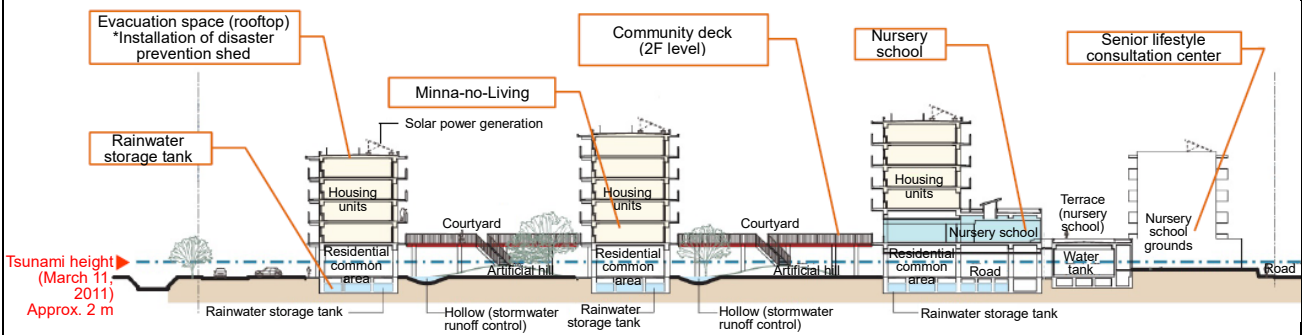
Cross-sectional configuration image (Source: Reconstruction Agency)
